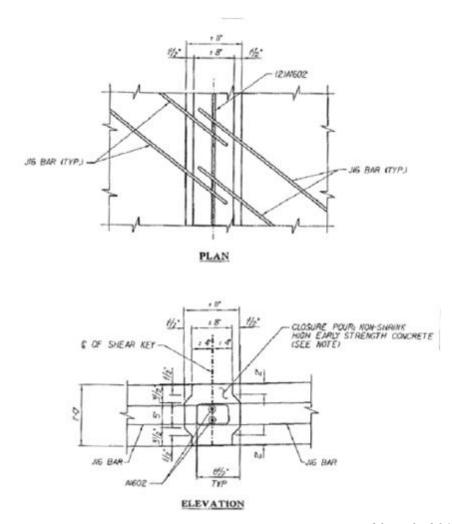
Plan and elevation views of longitudinal joint (Ziehl et.al., 2015)
